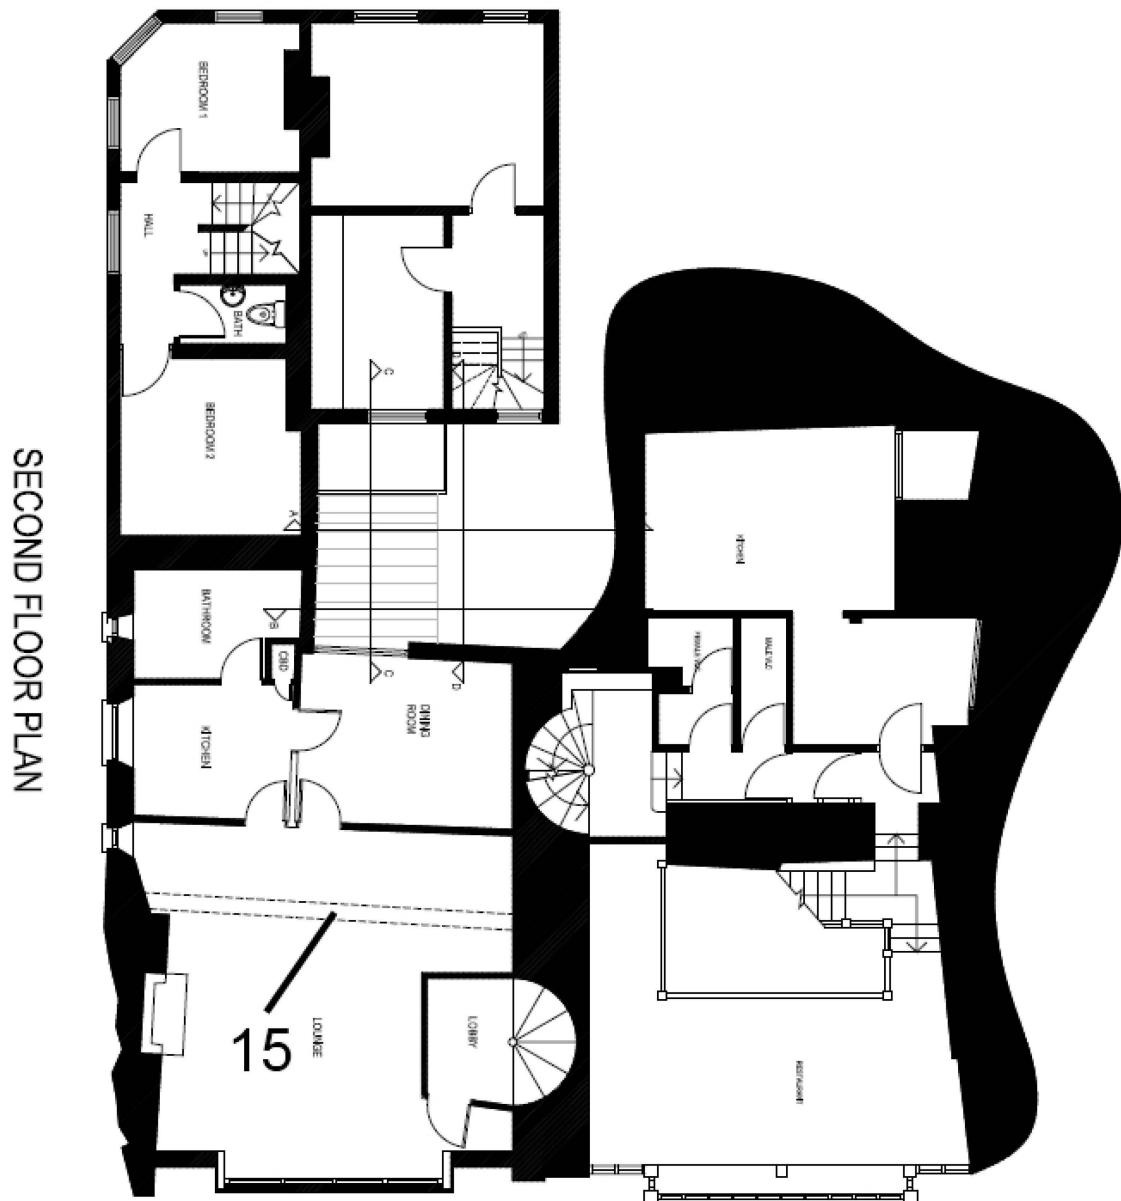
Second-floor plan showing the location of sample 15, adapted from original drawings by BBH Chartered Architects (Dartmouth) Ltd
